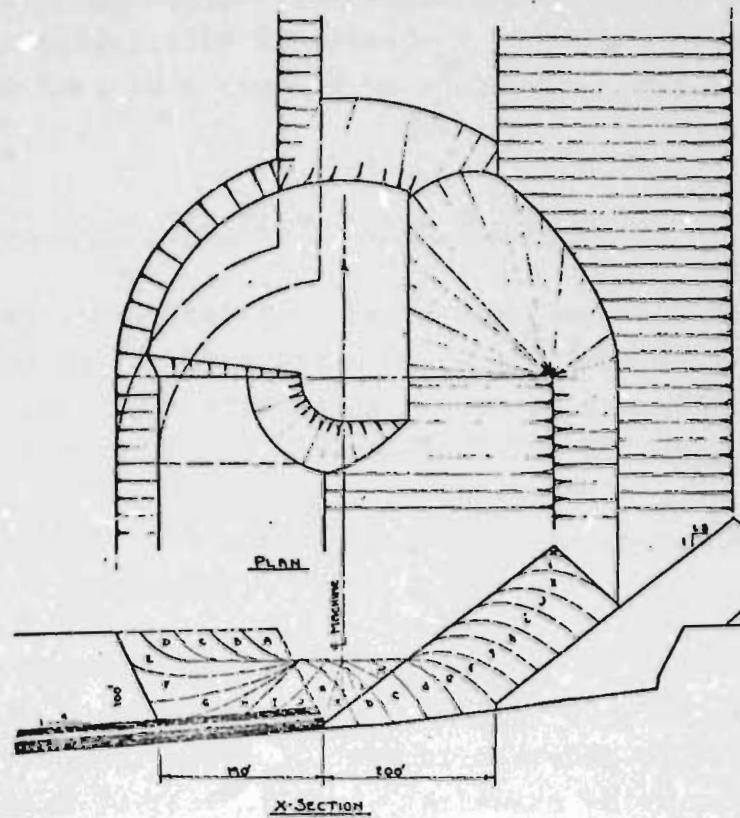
Direction of movement of overburden in open-cast mining shown by plan and in detail in the cross section (from Weimar, 1969, p. 10).
